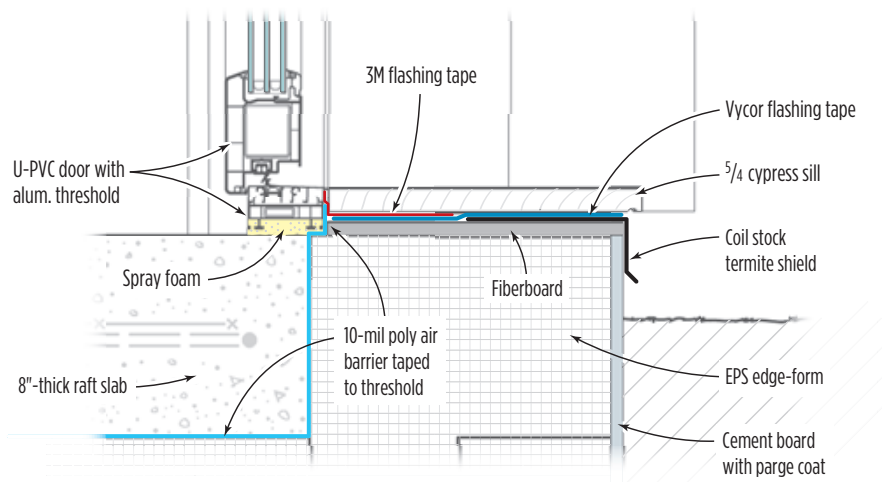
The Intus exterior doors were installed flush with the inner face of the double wall and the door bucks carefully insulated with EPS to cut thermal conduction.
